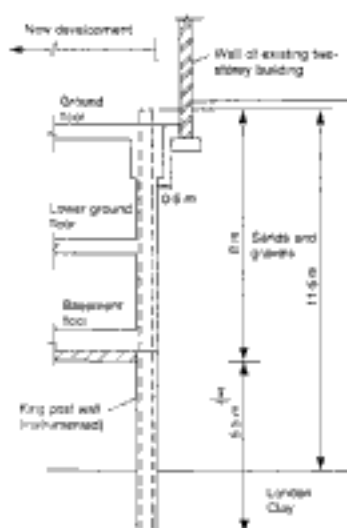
Vertical cross-section through part of a substructure basement, Marylebone, London (Mair²⁰)
